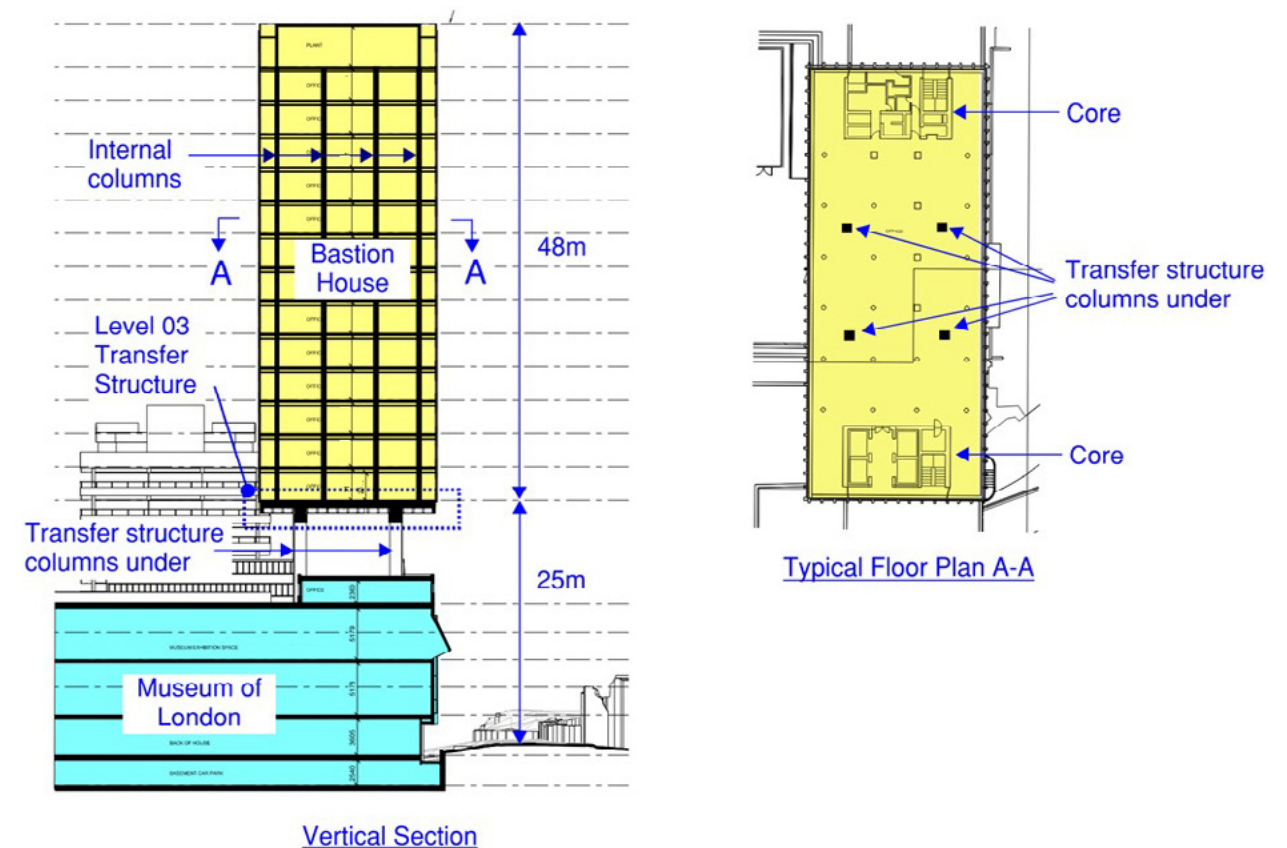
4 Bastion House and Museum of London Simplified Section and Plan
